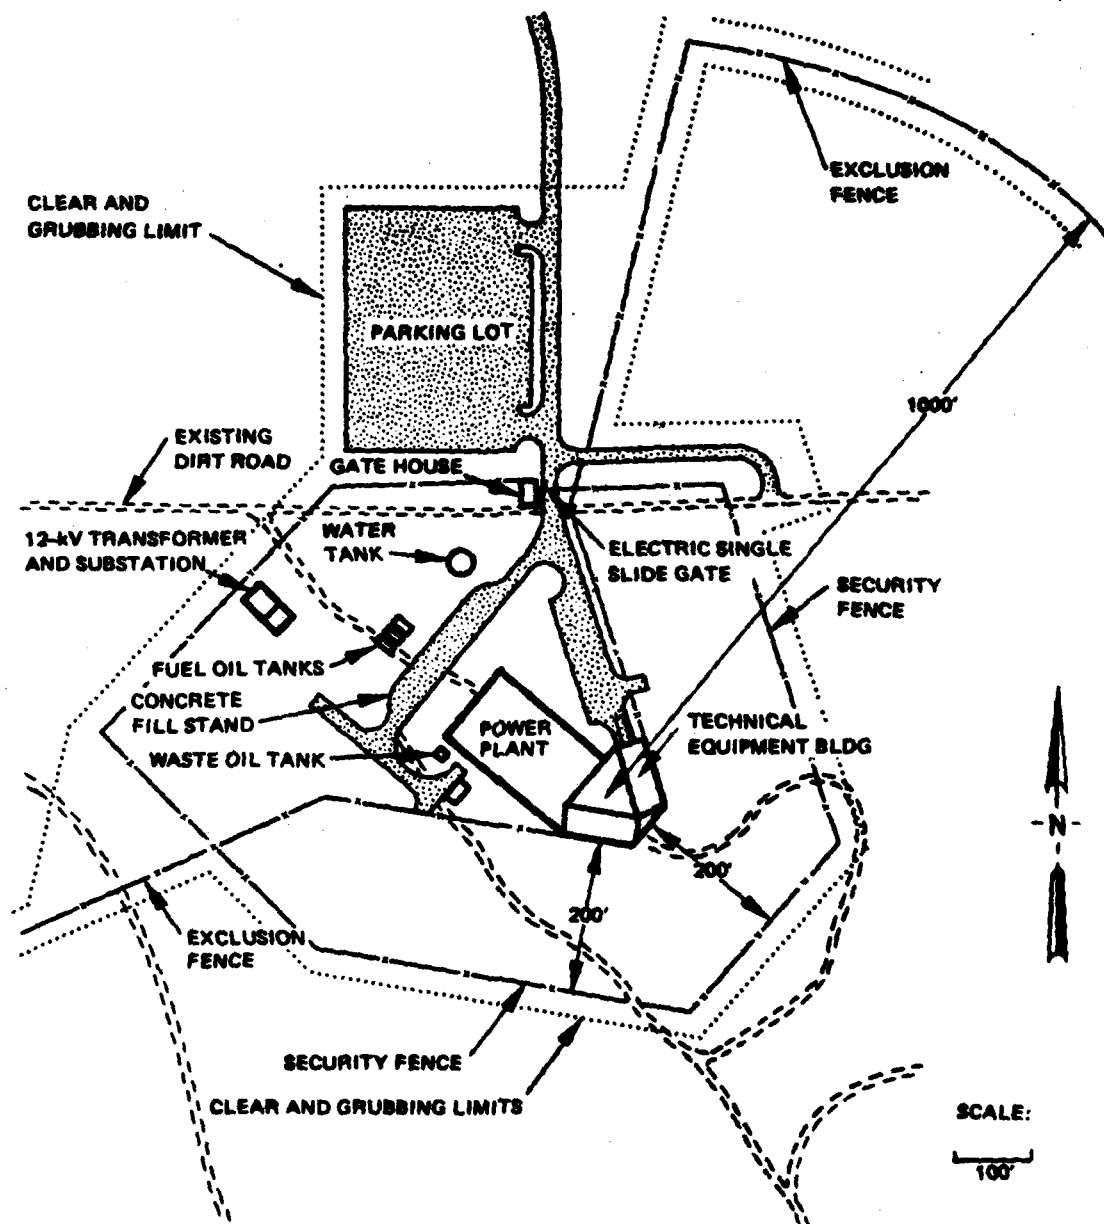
PROPOSED SITE PLAN FOR PAVE PAWS
